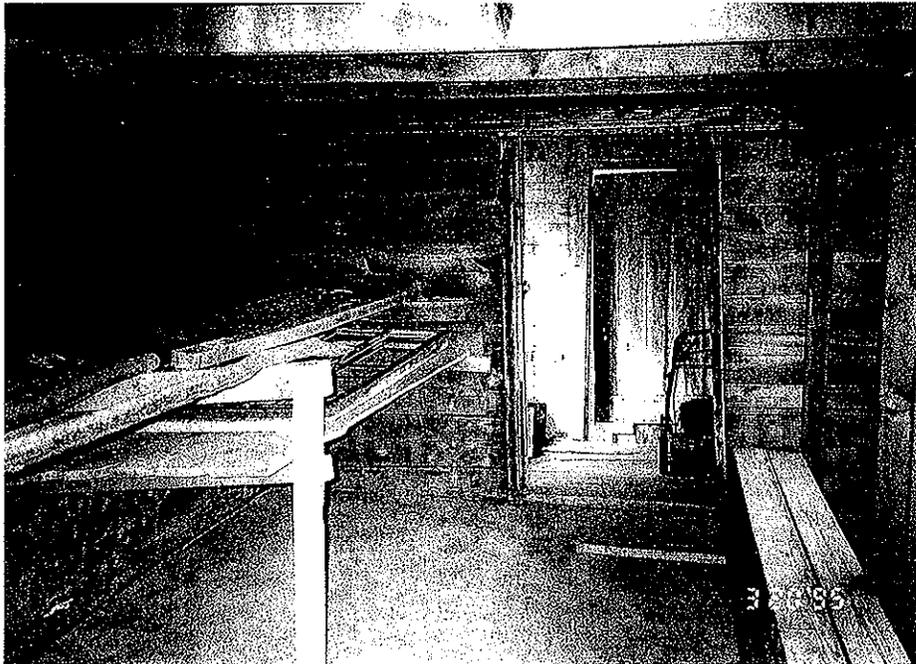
Weir Ice House – Chicken Coop [Room 101], Looking North into Lean-to Shed (1995).
